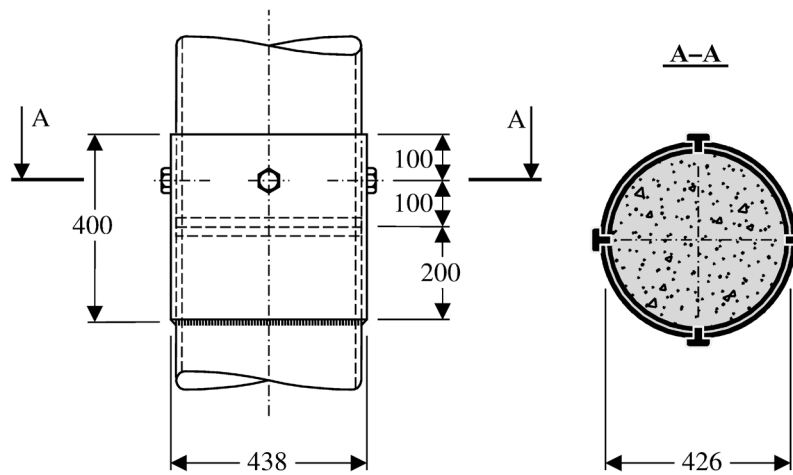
The dismountable joint of concrete-filled tubular elements with steel coupling for the considered combination of loads.
